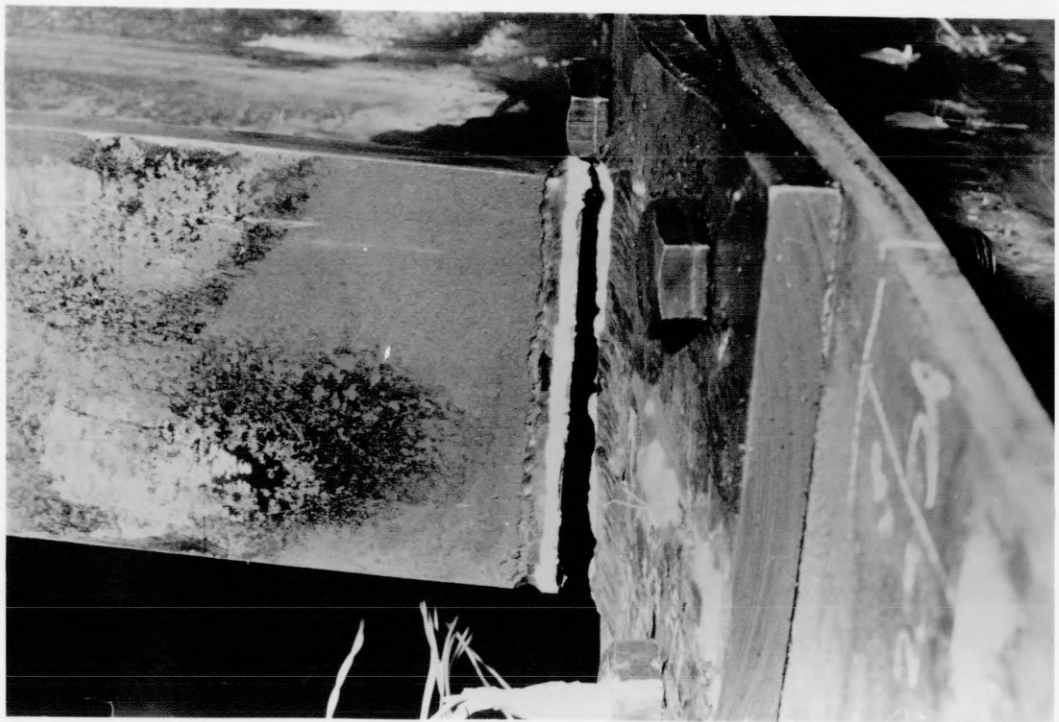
Weld cracking at outer edge of beam tension flange
